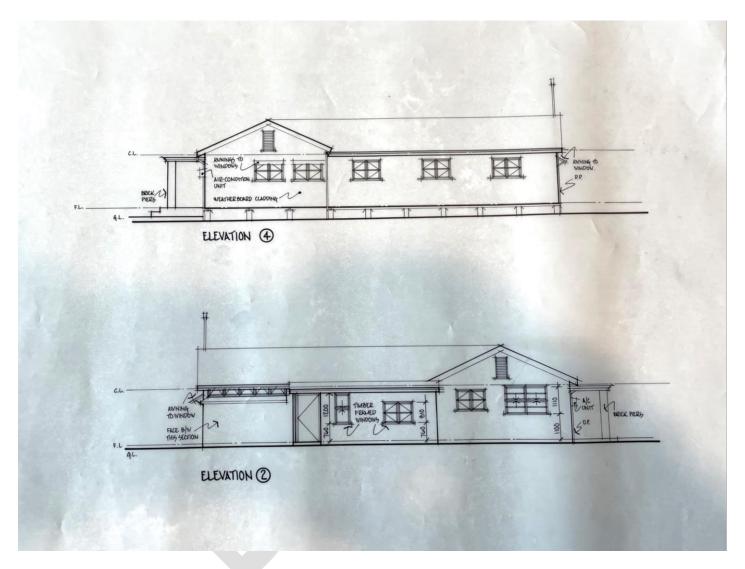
North and south (side) elevations of former RAAF Headquarters building (Source: provided by Aeria Management Group)
